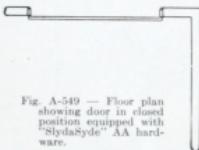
Floor plan showing door in closed position equipped with "SlydaSyde" AA hardware.
